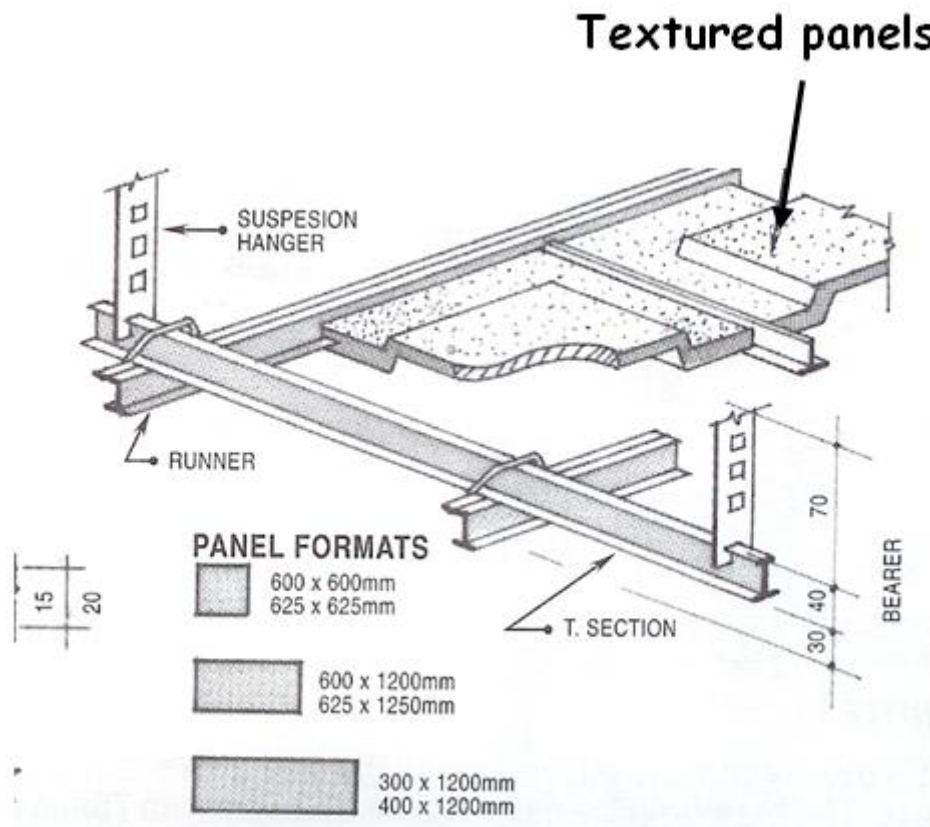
Example of a mild steel grid system for a suspended ceiling
